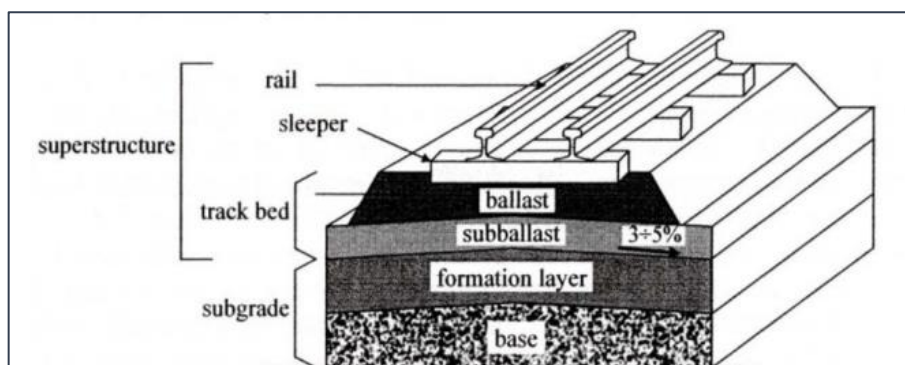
Railway track with ballast (Profillidis, 2006)
